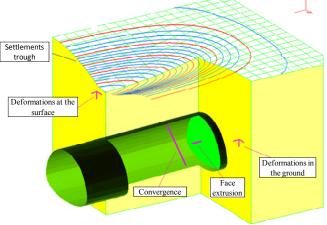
Ground deformations and surface settlements during excavation of a shallow tunnel
